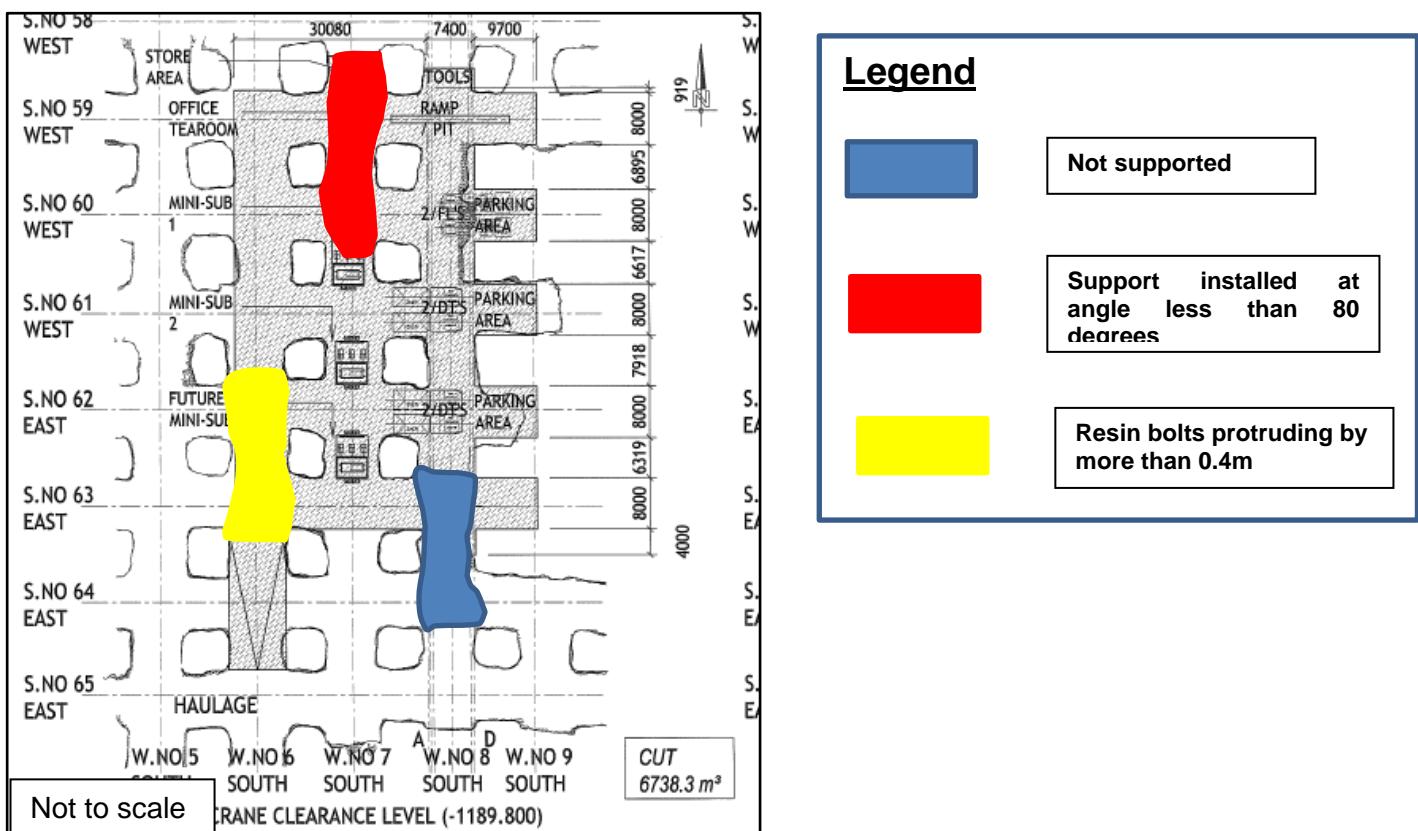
Plan indicating the support installed on the hangingwall at proposed battery bay (hatched pattern)
